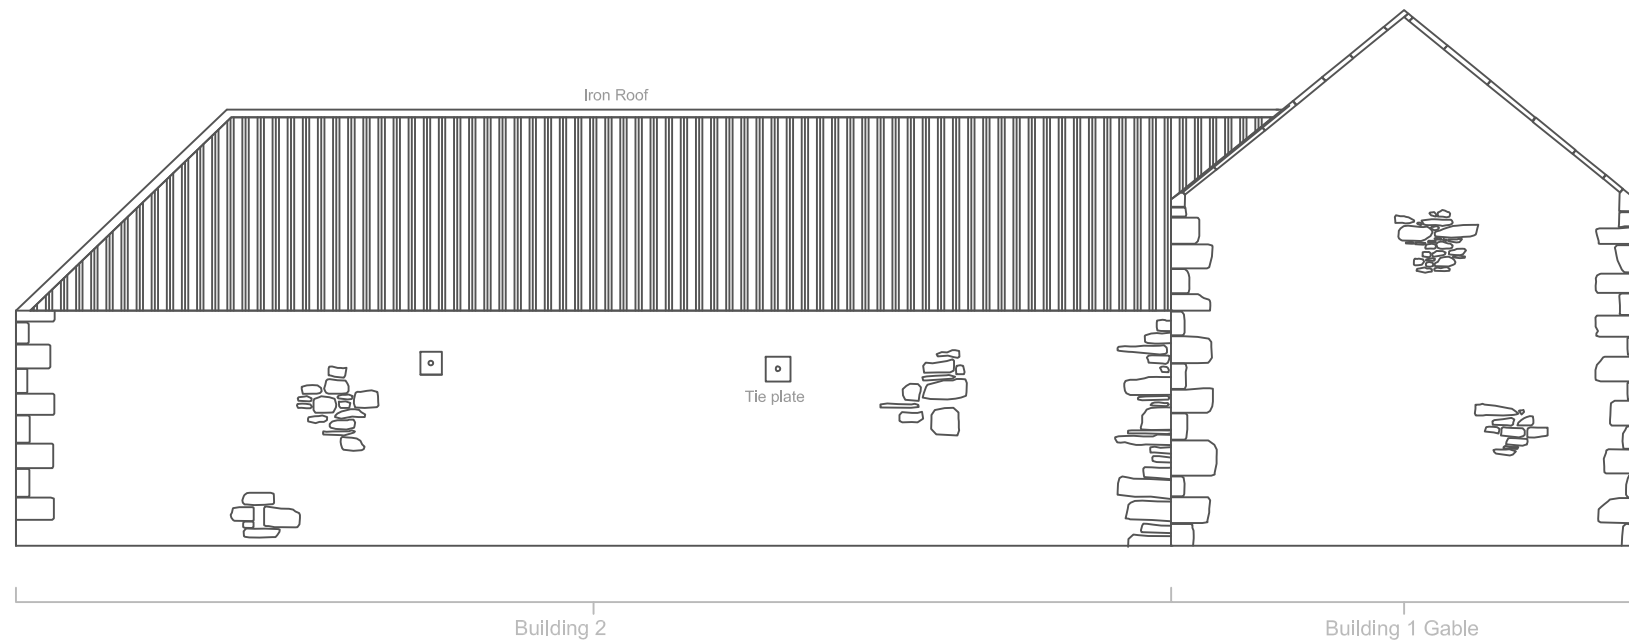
Buildings 1 & 2, Northwest-facing elevation
